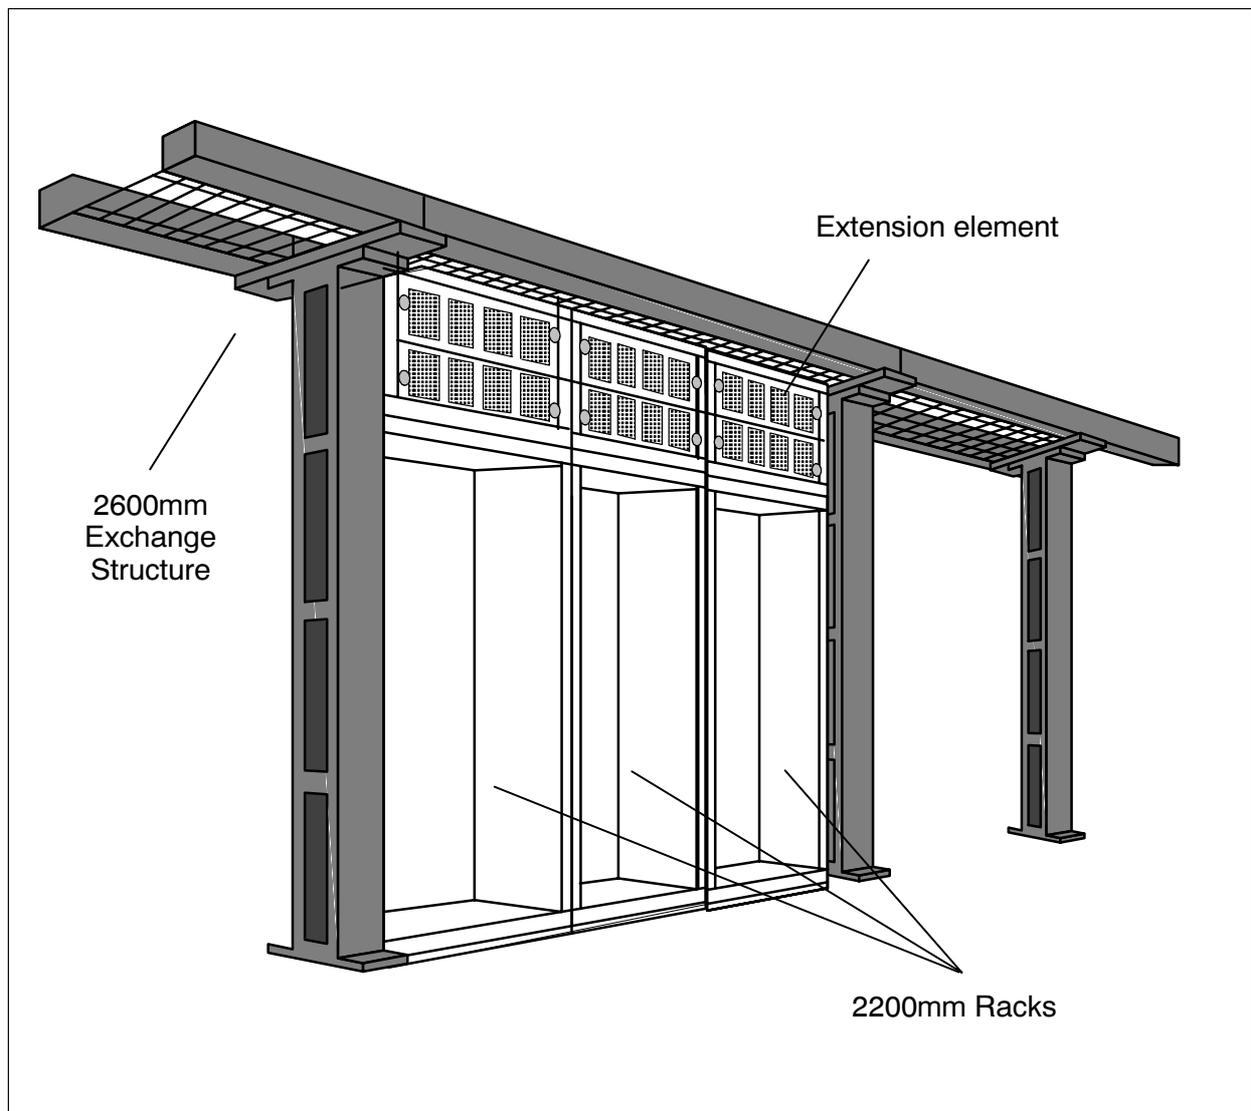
View of racks installed in an exchange with 2600mm structures
